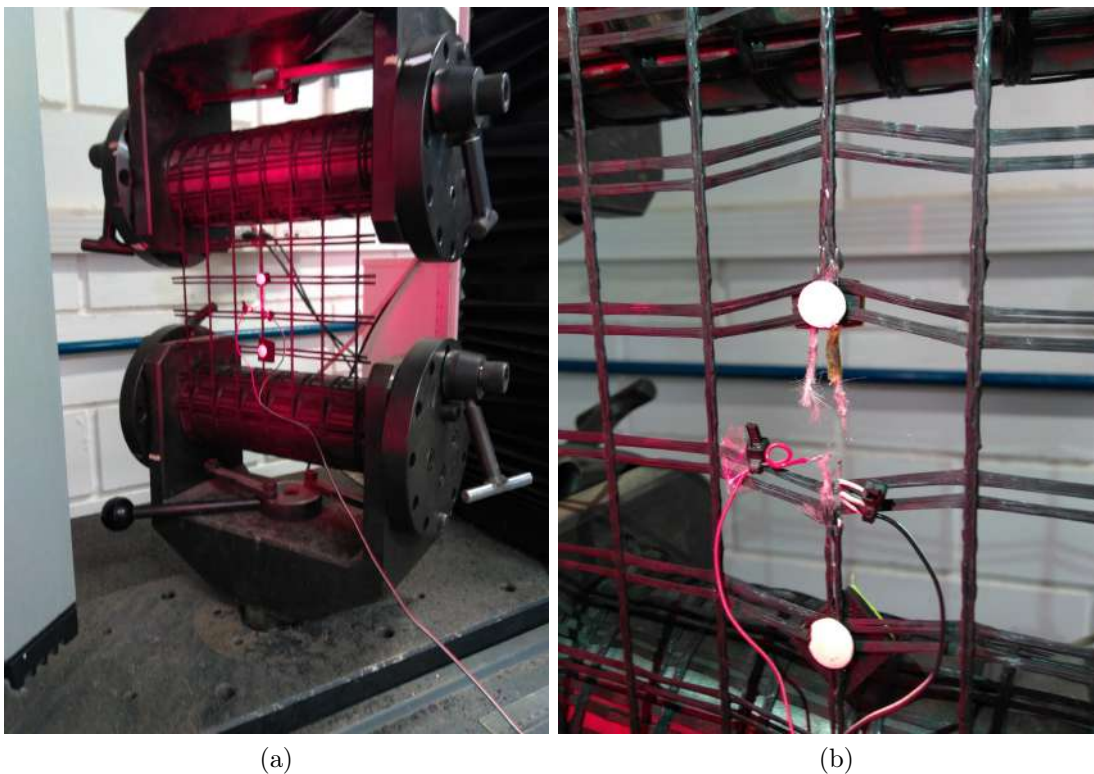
Strain-gauge calibration test: (a) geogrid mounted at the test machine (start of test); (b) geogrid after tensile failure (end of test).
